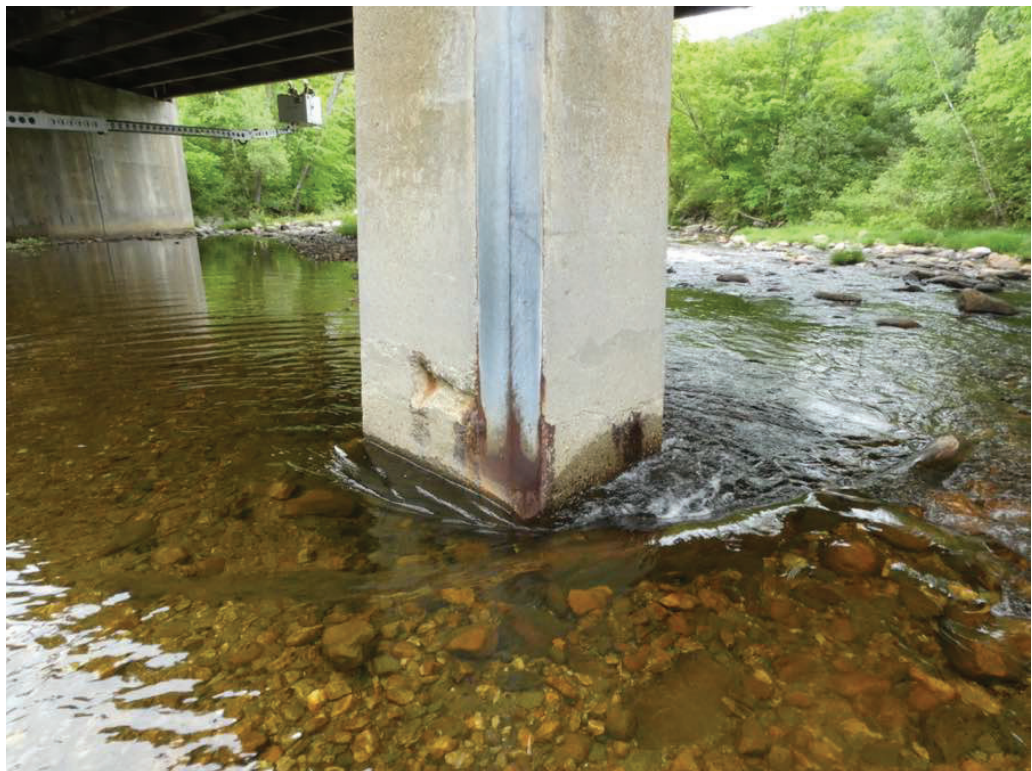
Spalling at the nose of the pier. Also, note the scour and debris at the north end.
